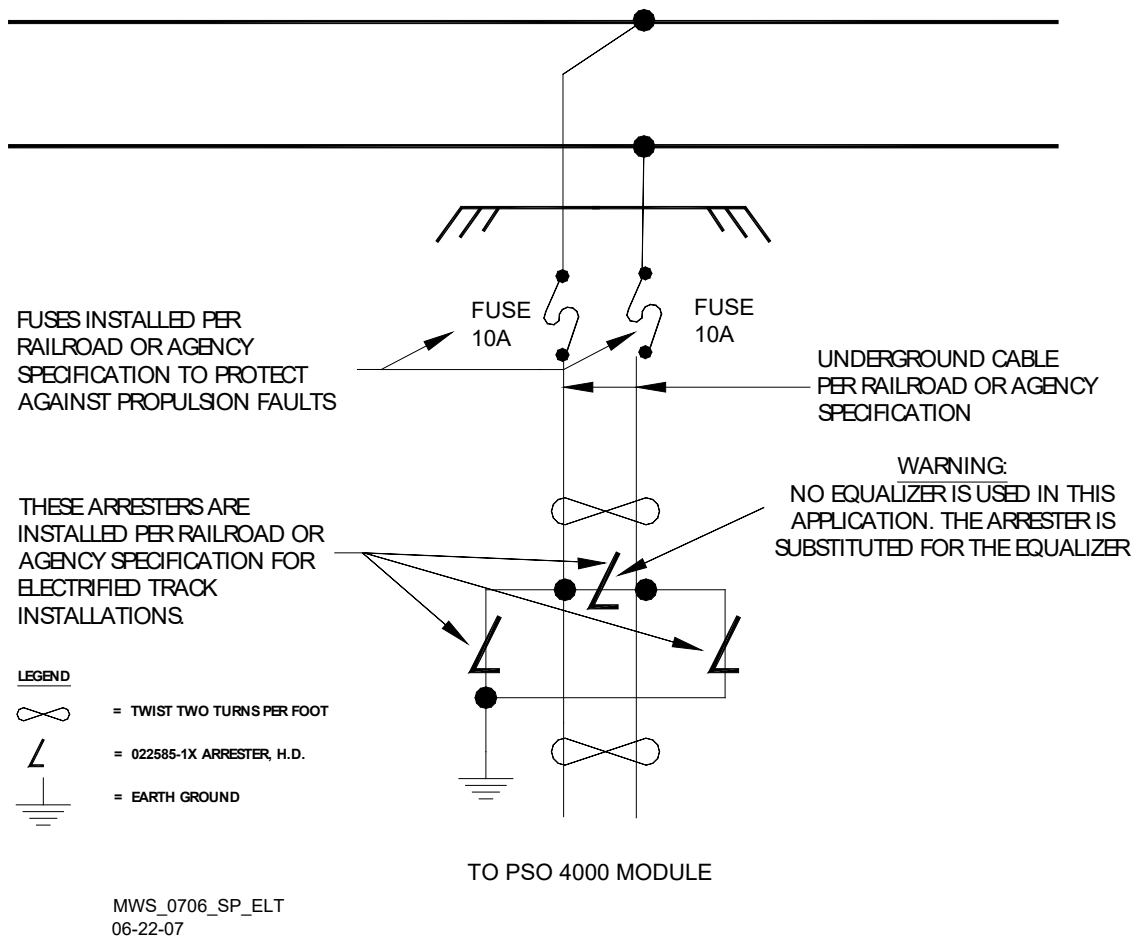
Surge and Fused Track Wire Protection in Electrified Track
